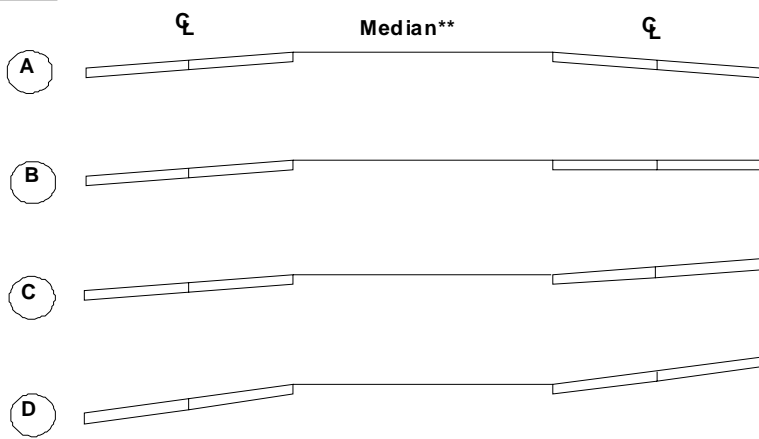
Method of Attaining Superelevation – Four Lane Divided Highway
